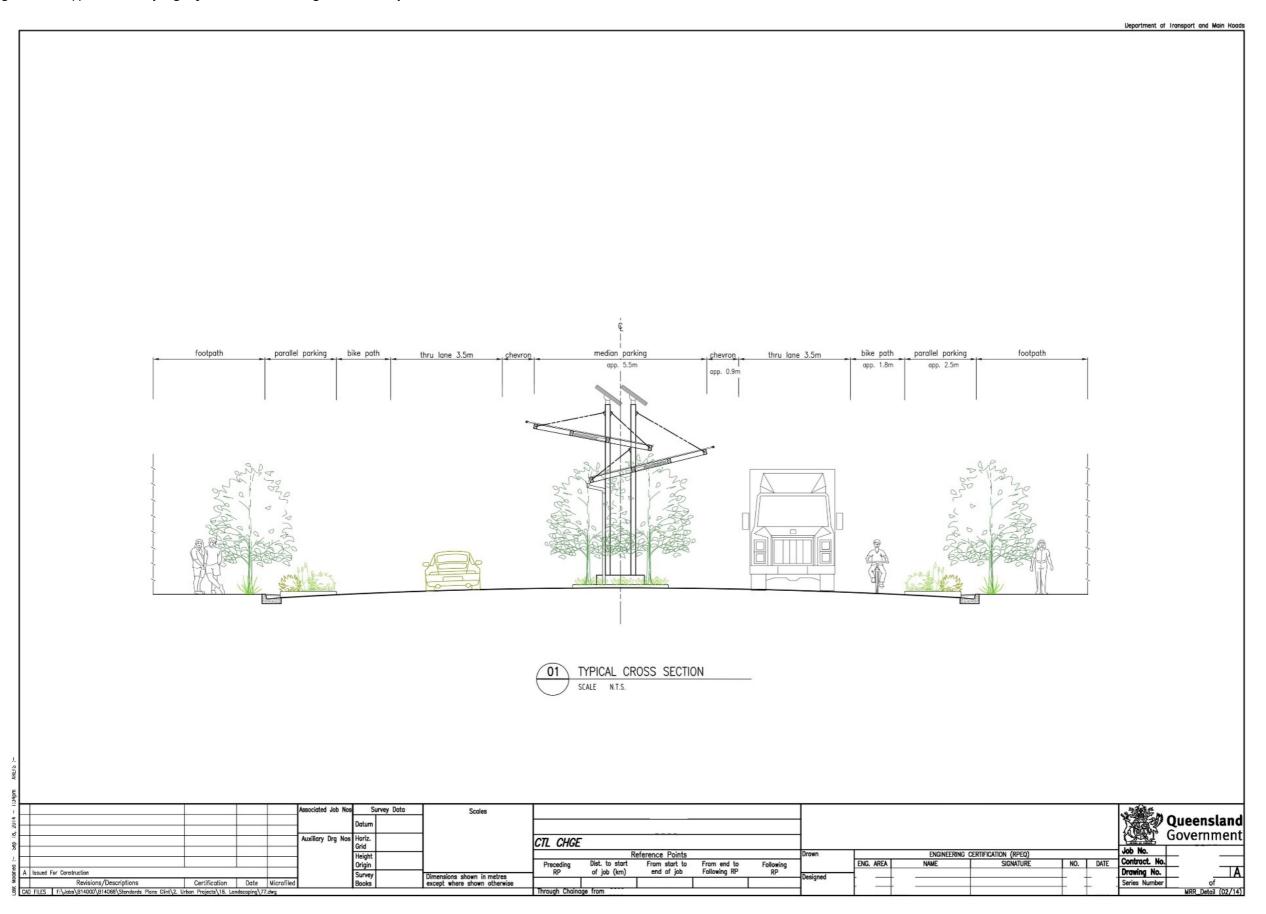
(g) – Landscaping layout and details – generic example 7
